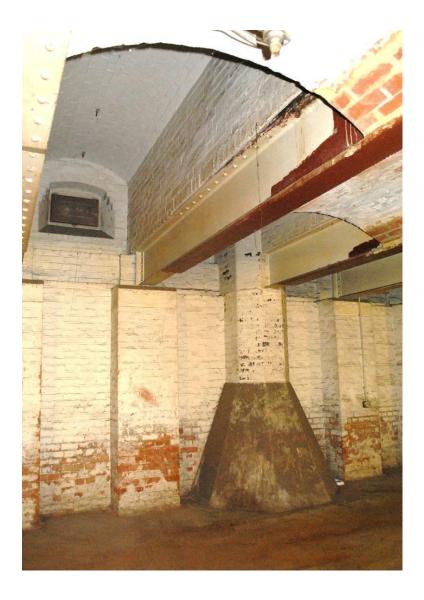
Dividing wall between Basement and Dock, with flared column base and ventilation shutter. View from SE.
